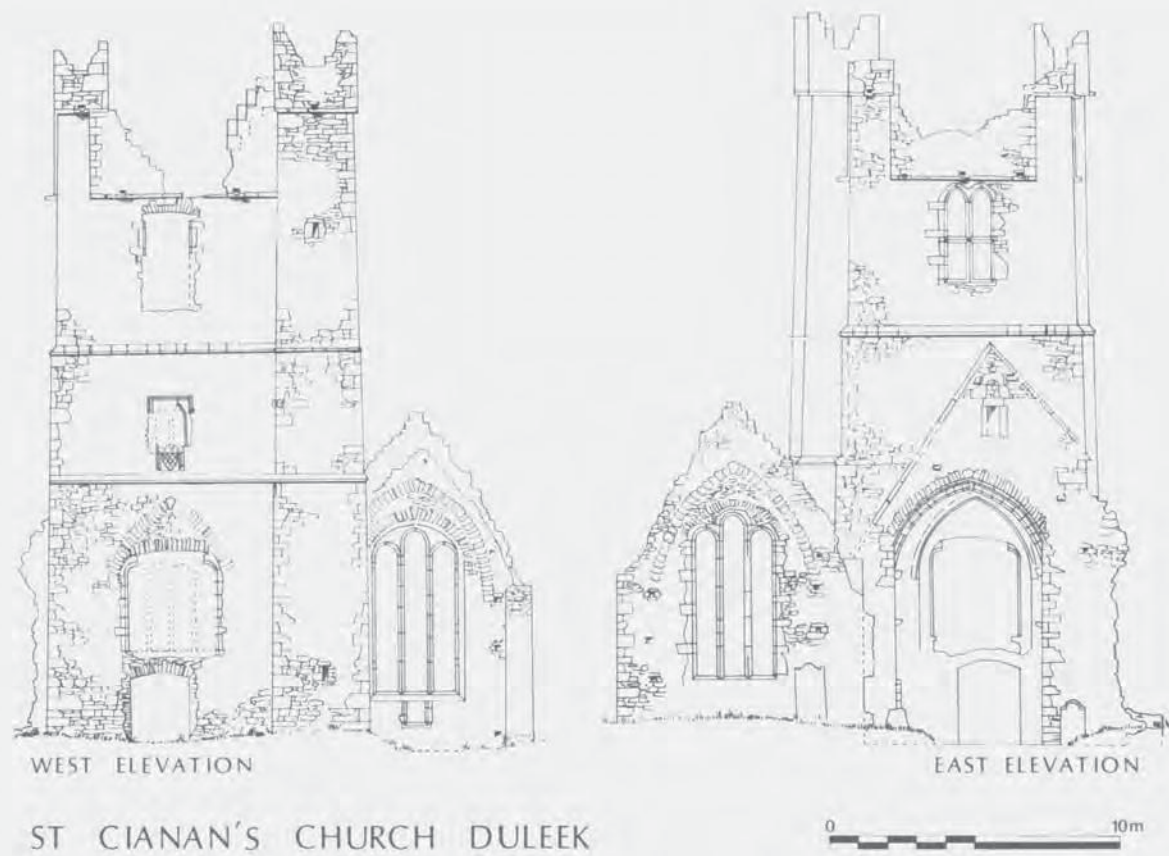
Duleek: St Cianan's church: east and west elevations.
